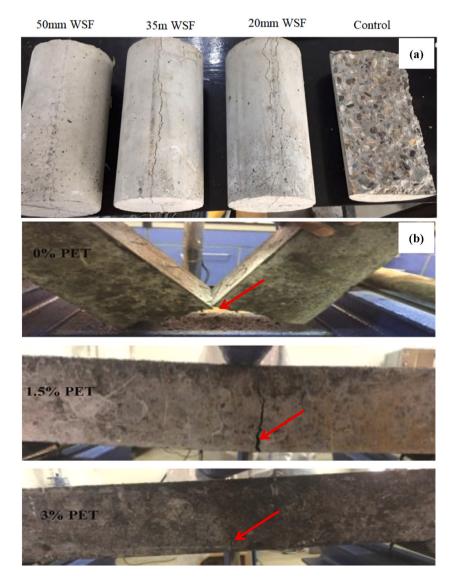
Crack resistant behavior of control and waste synthetic fiber reinforced concrete after (a) split tensile strength test and (b) flexural strength test from Mohammed & Mohammed [93], and Adnan & Dawood [54], respectively, permission Elsevier.
